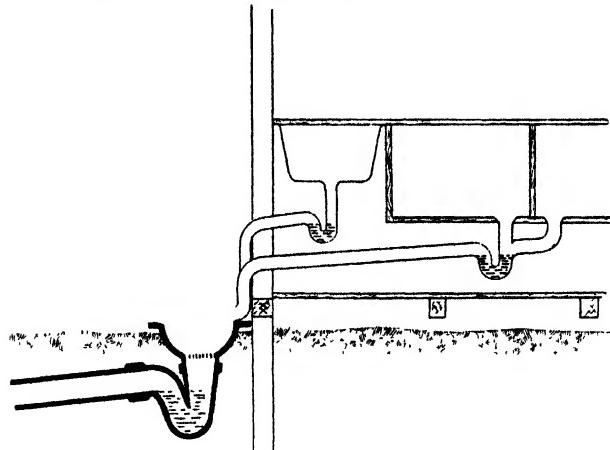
Showing how waste pipe should be run separately into the disconnecting trap.
